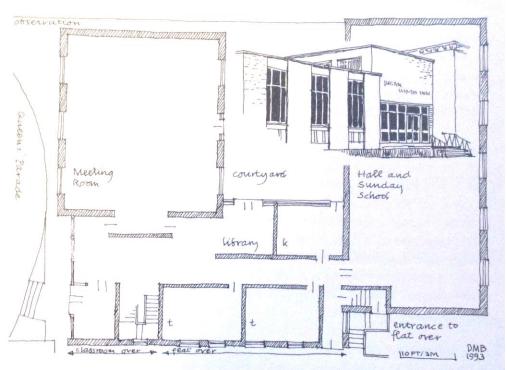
Ground floor plan of the meeting house, as reconstructed by Butler (north is to the bottom right corner: not to scale) (Butler (1999), vol. II, p.803)
